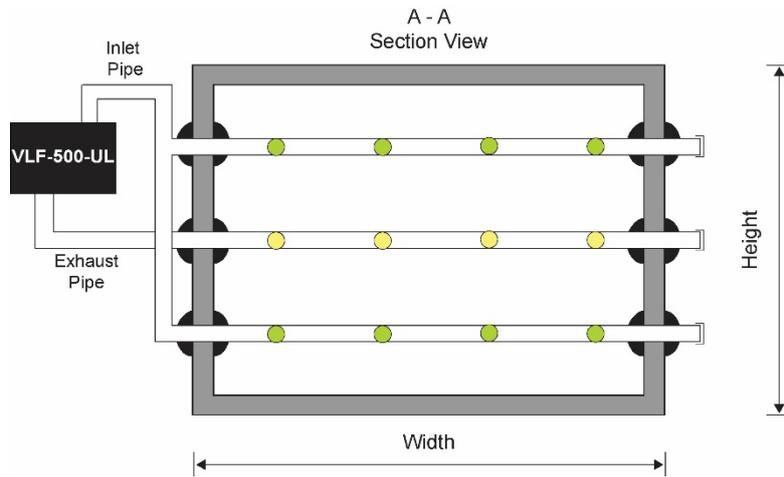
Cross-section view of the inlet pipe sampling hole setup and exhaust pipe in large ducts.
